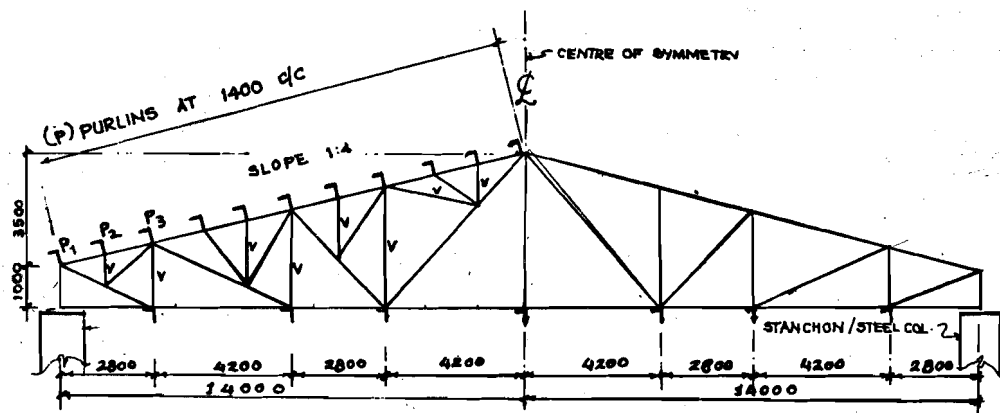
(c) : Alternative Internal Pattern of Truss Members with Shorter Vertical End Member
